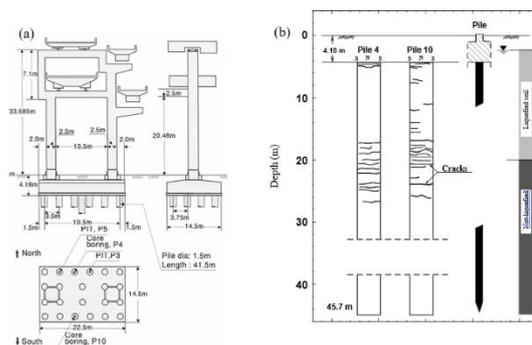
(a) Side view of the pier and plan view of the foundation; (b) Observations of damage to piles
